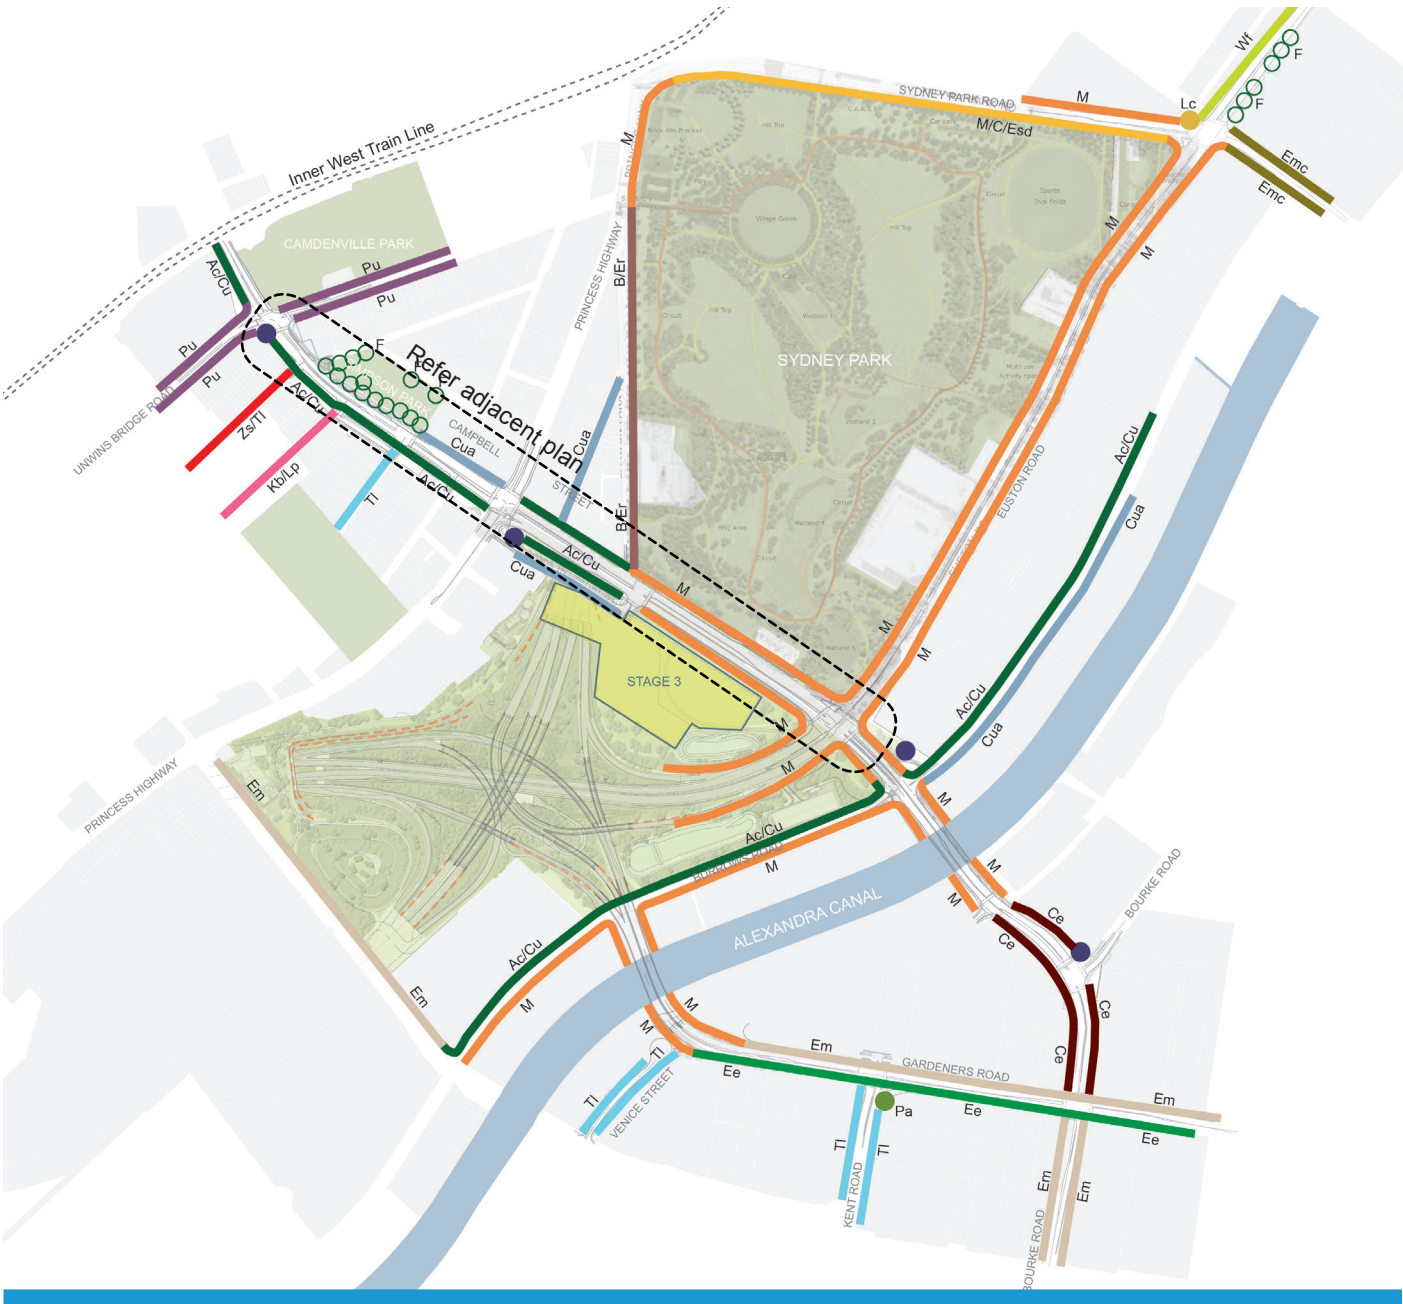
Campbell Street Green Link - Street Tree Strategy - Keyplan
